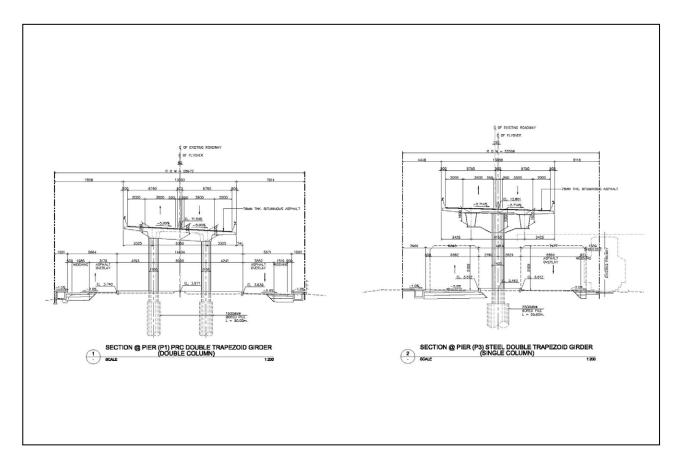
TYPICAL CROSS SECTION (TANGGULANGIN)
